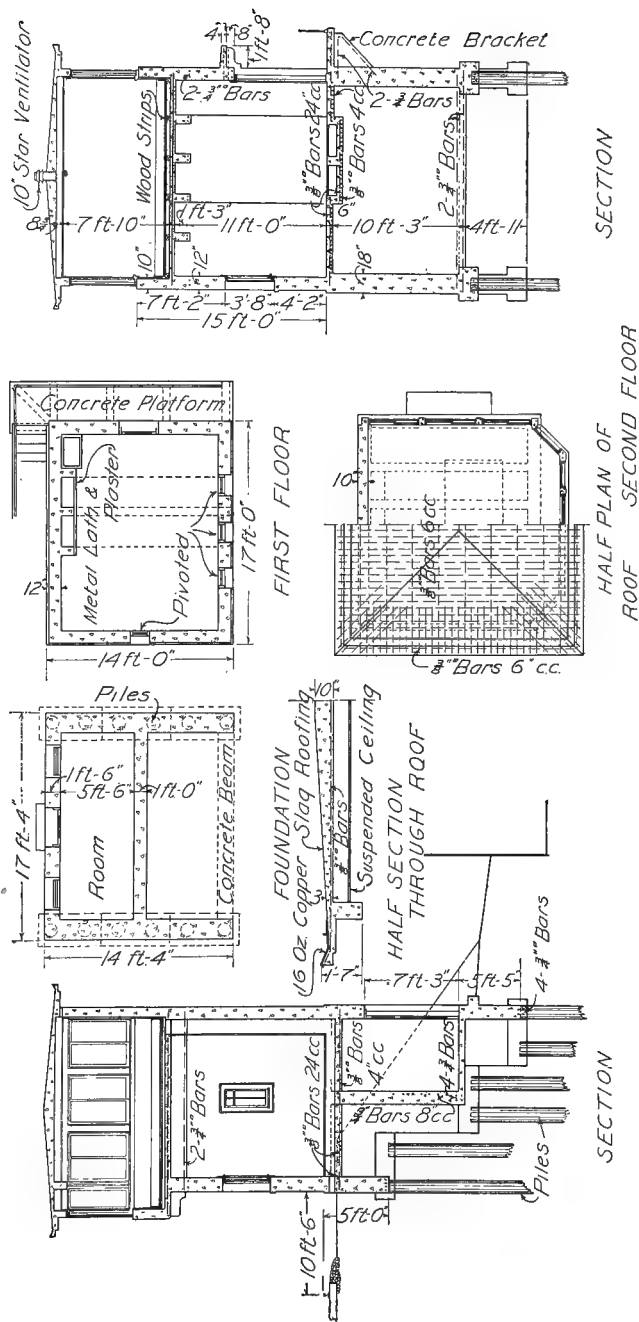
DETAILS OF CONSTRUCTION, GROVE ST. SIGNAL TOWER, D., L. & W. R. R.
